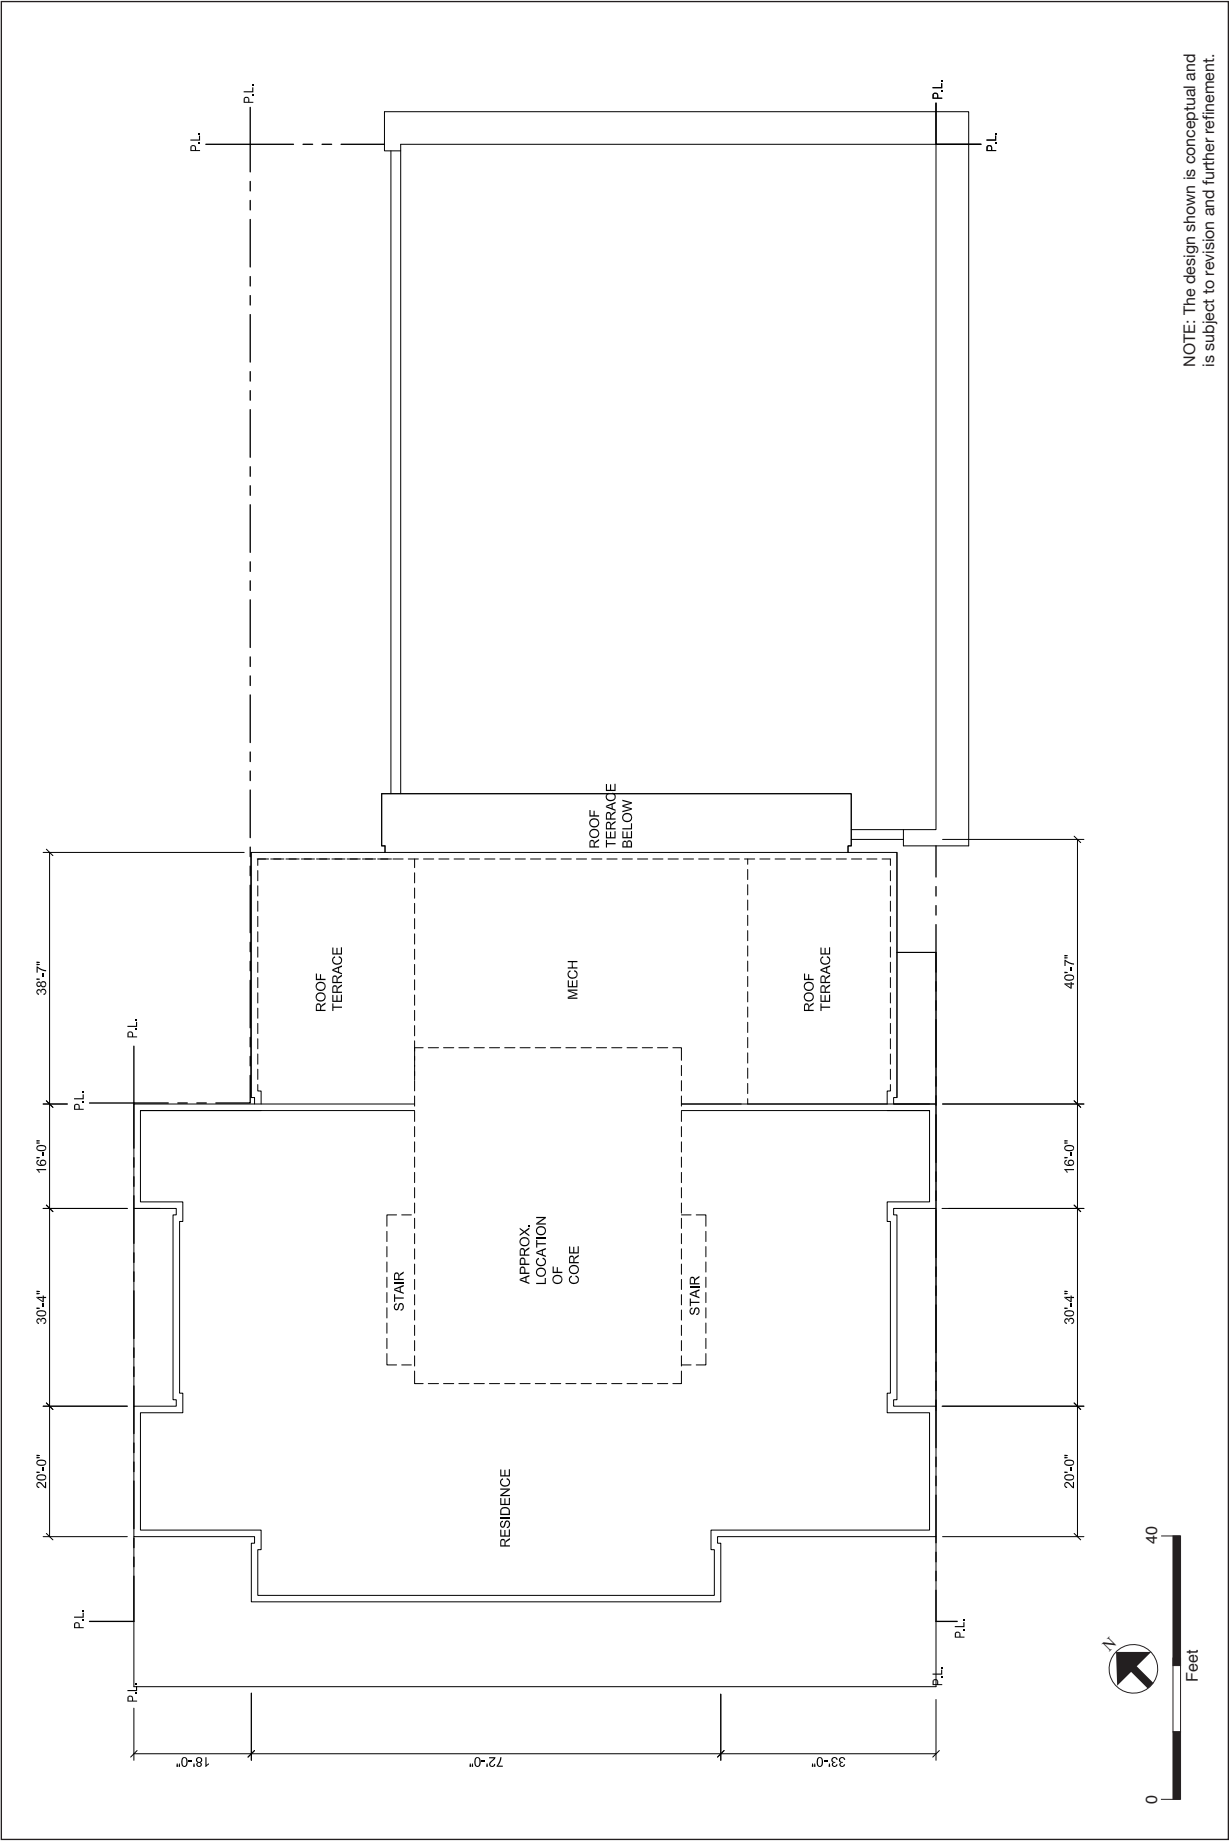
CONCEPTUAL FLOOR FOR FLOORS 15 THROUGH 43 - TOWER
